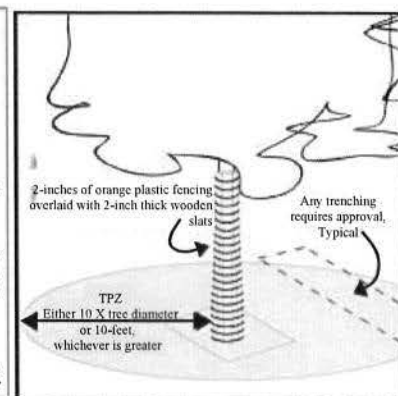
Type III Tree protection with trunk protected by a barrier to prevent mechanical damage. Image City of Davis.
